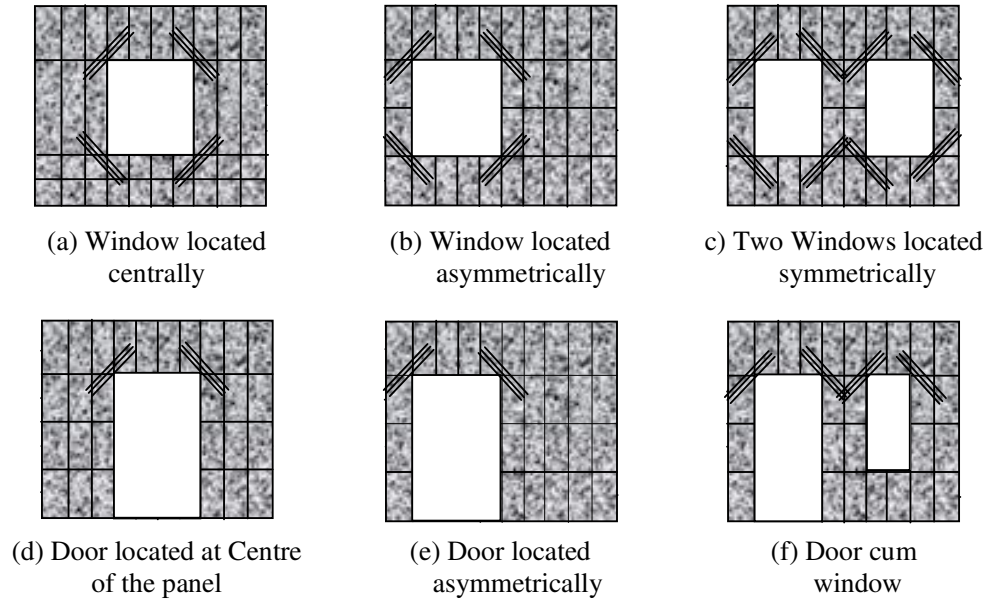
Shear wall panel with different opening positions (Saheb and Desayi, 1990)
